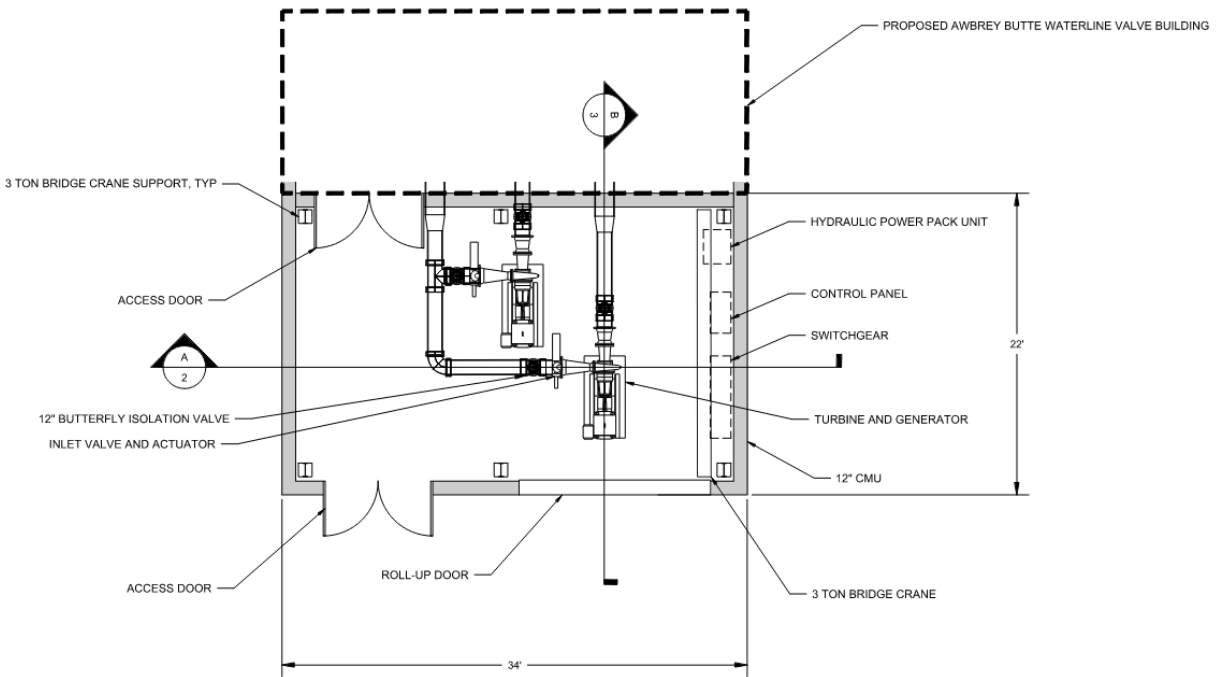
Plan View Building Layout of Proposed In-conduit Hydropower Facility
